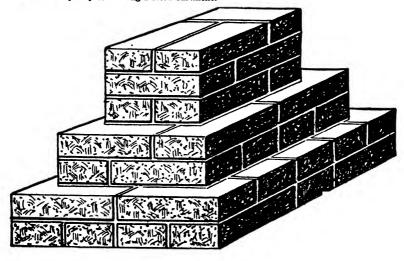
,361 —Footing for 8×12 solid pier showing bond.
